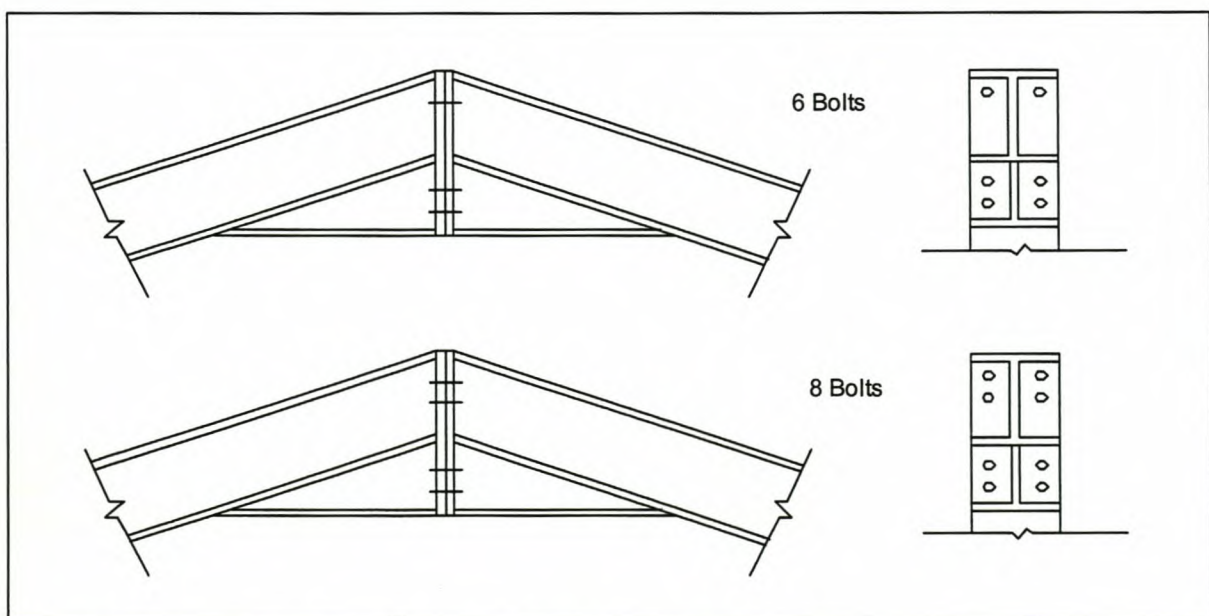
Alternatives for Haunched Flush End Plate Ridge Connections
